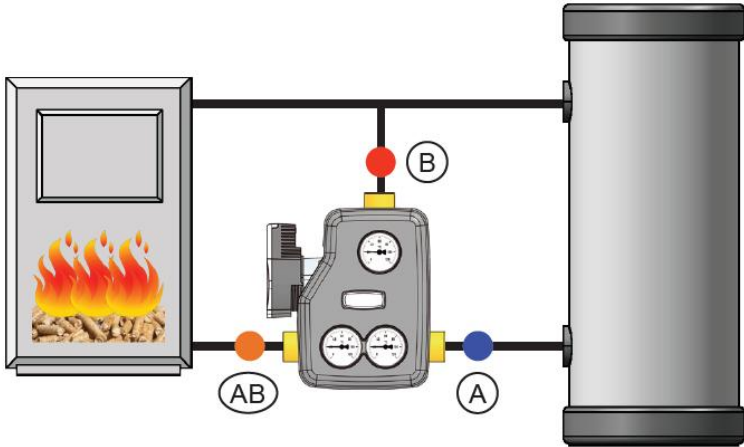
Installation of the RTA heating pump assembly in a system with a solid fuel boiler on the left-hand side.
